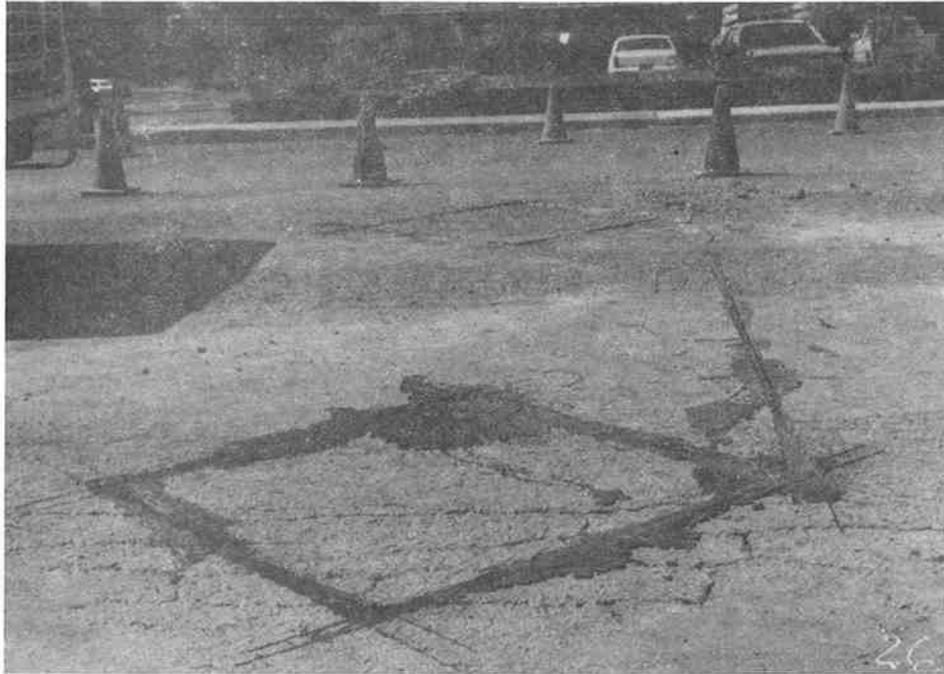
One unanticipated problem was encountered as the epoxy was placed in the saw cut. The conduit floated. This was countered by pouring just enough epoxy into the cut to catch the bottom of the conduit. After the epoxy set, it held the conduit in place in the bottom of the cut.
